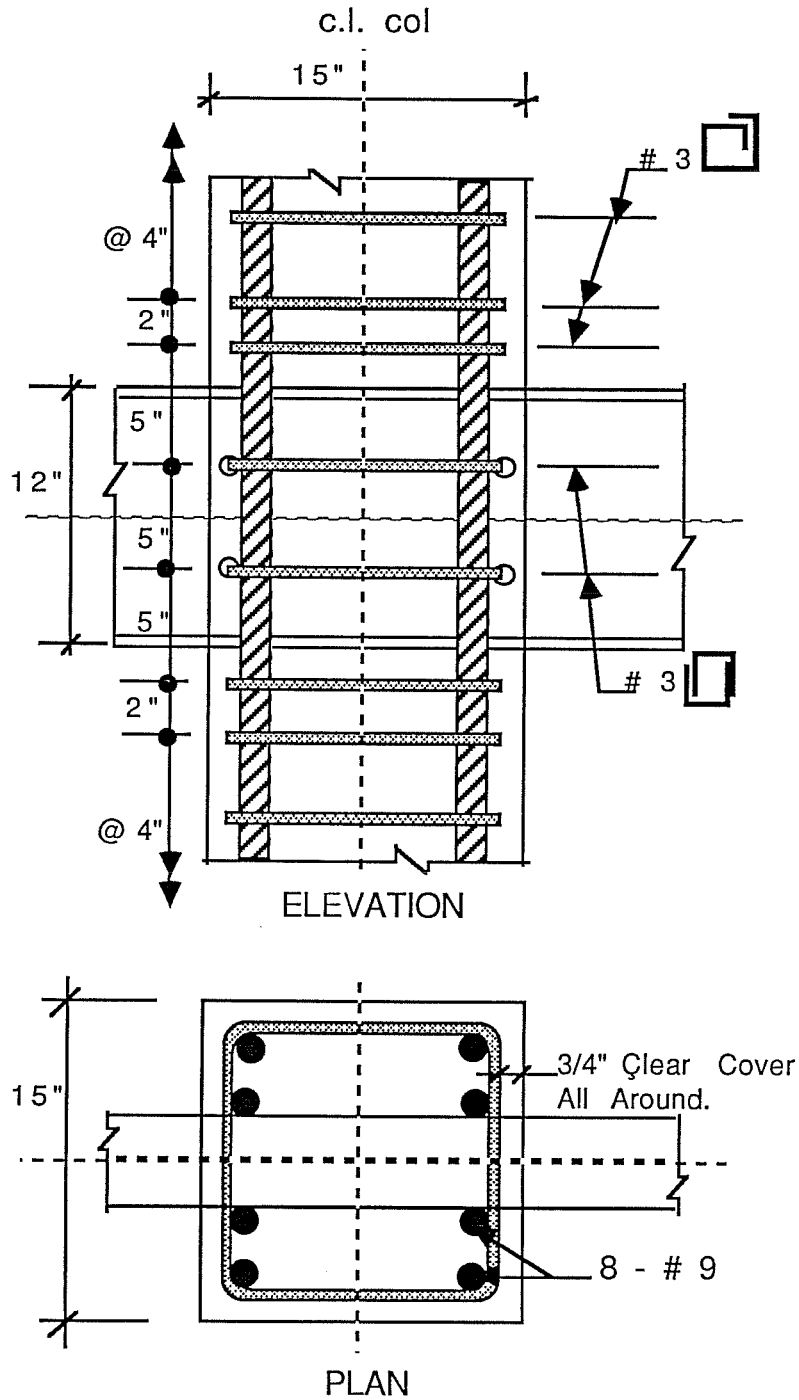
Joint Reinforcement for Specimens 1 and 2
